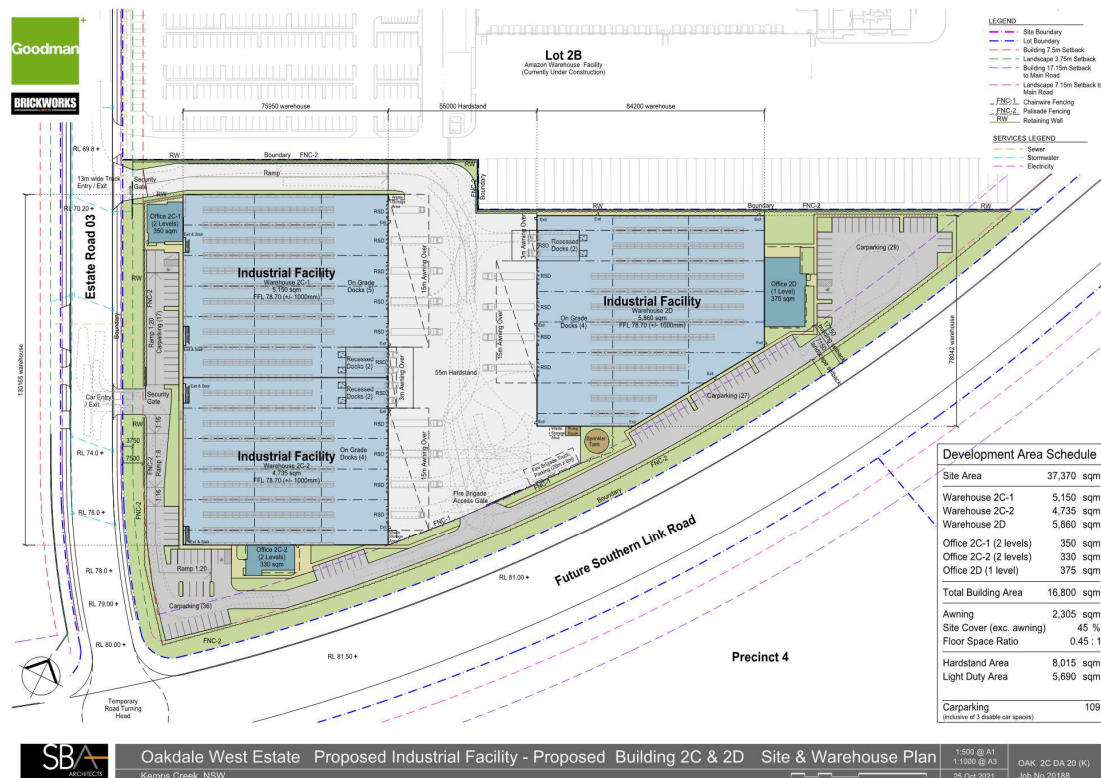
Amended site plan providing revised access to Building 2D carpark (Source: SBA Architects)
